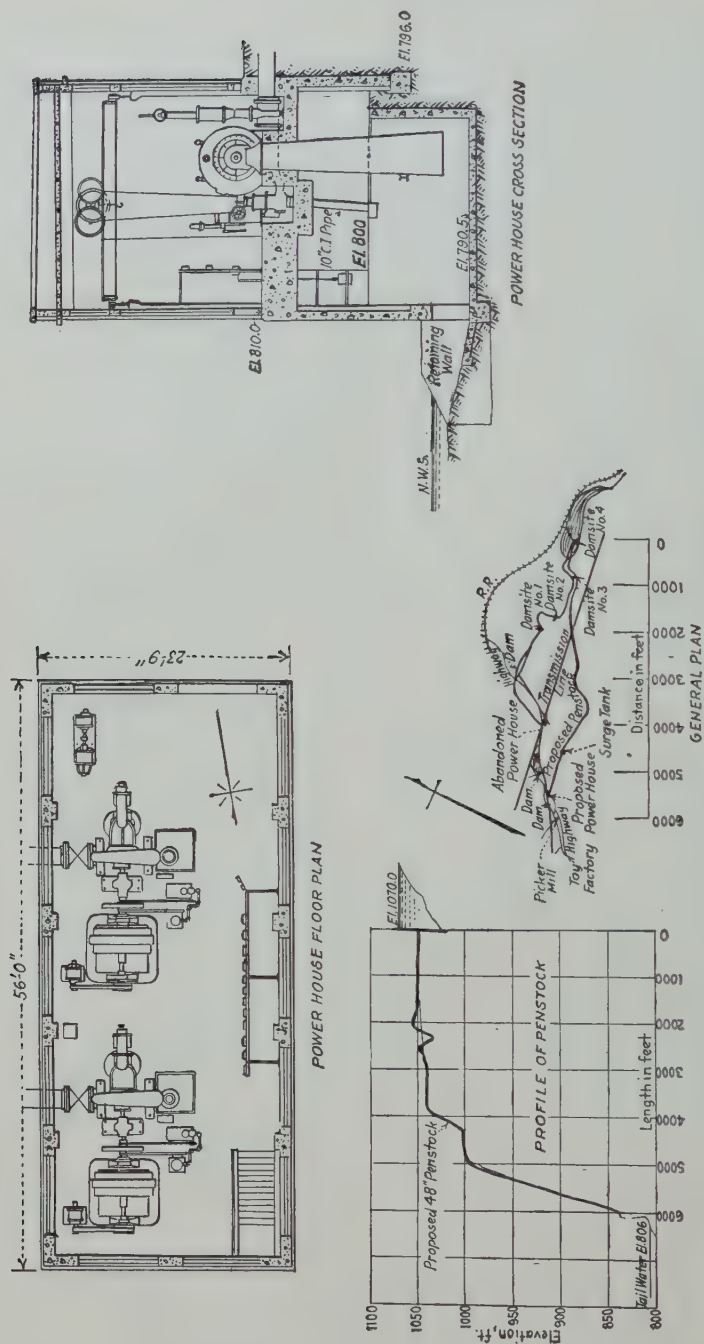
Marlboro plant—Keene Gas and Electric Company. General plan and profile and power house layout.
